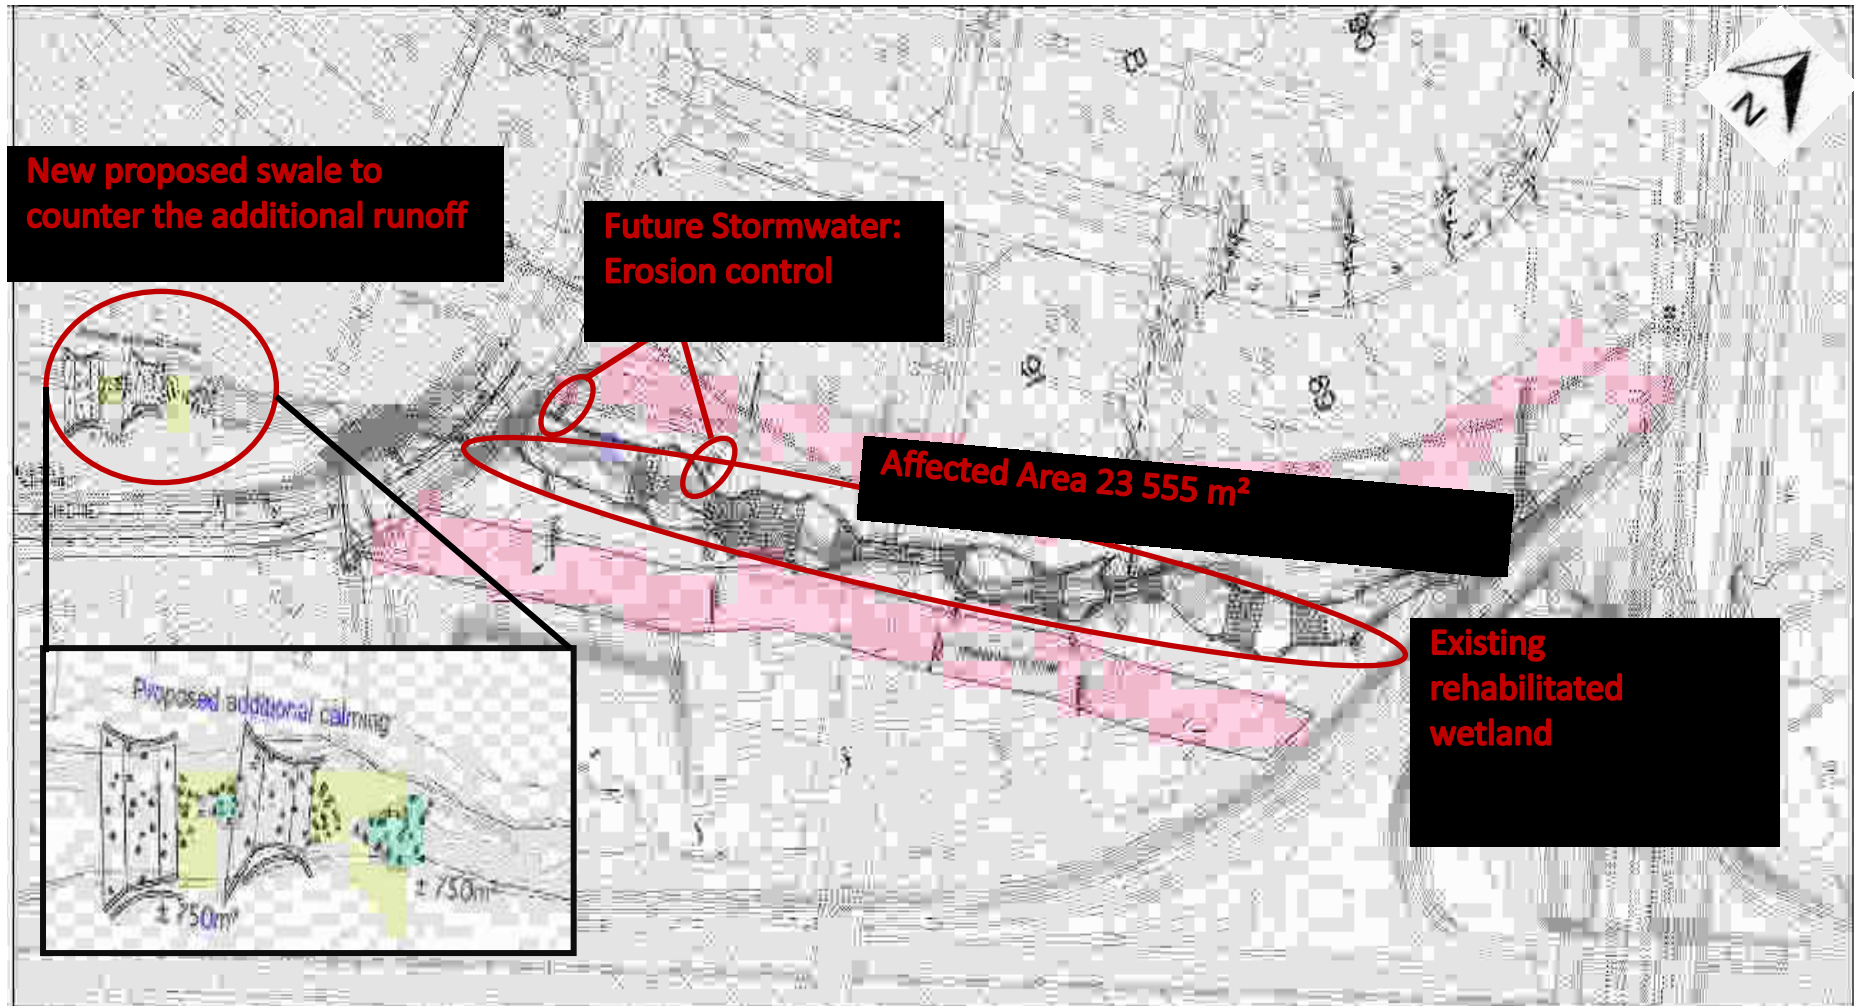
Previously approved layout plan including the rehabilitated wetland area and approved storm water layout.
